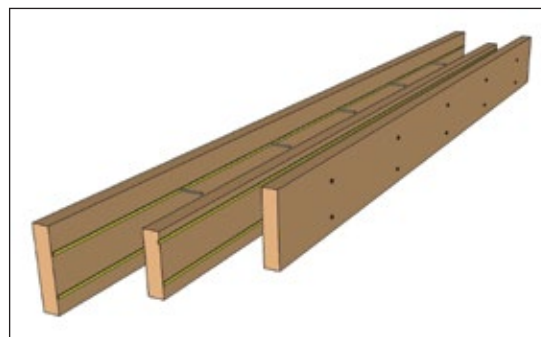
Adhesive placement between 2 × 8s in nail laminated wall.
